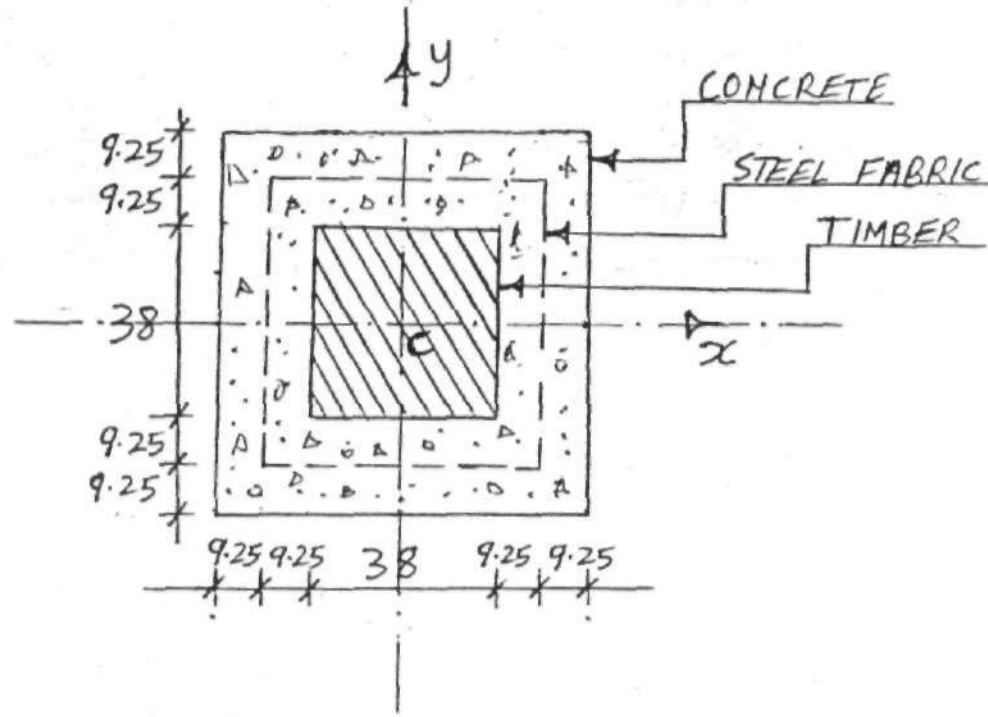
Cross-section of the Specimen (Dimensions in mm)
